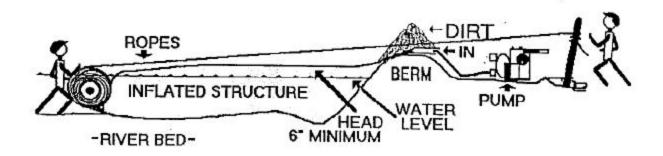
Cross section of a partly installed structure. Note location of the berm, pumps, ropes, and labourers.
